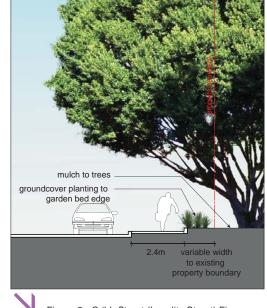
Cribb Street (Locality Street) Fig Tree section
